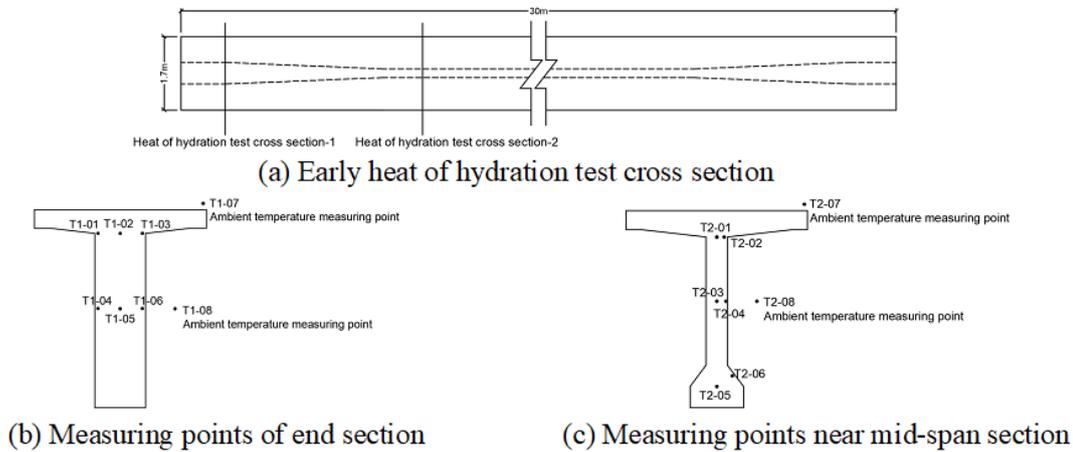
Layout Diagram of Test Section and Measuring Points for Early Hydration Heat
